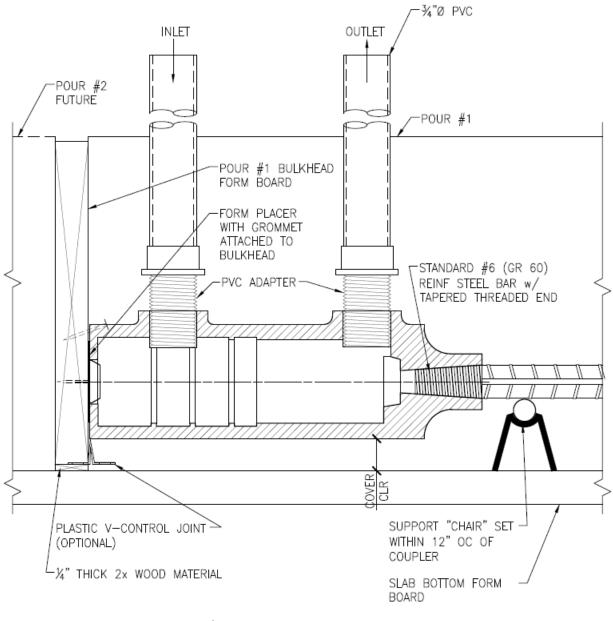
PS=Ø[®] COUPLER INSTALLATION IN POUR #1 Low Slab Location (mid-span)
